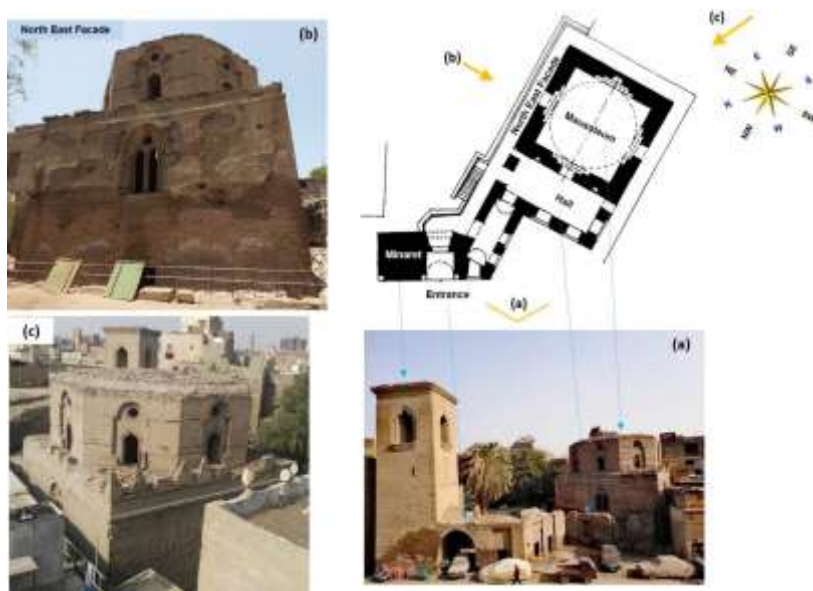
Plan showing the mausoleum parts (modified after Rizk [27]) and three external photos: (a) northwest façade; (b) northeast façade; (c) southeast façade.
